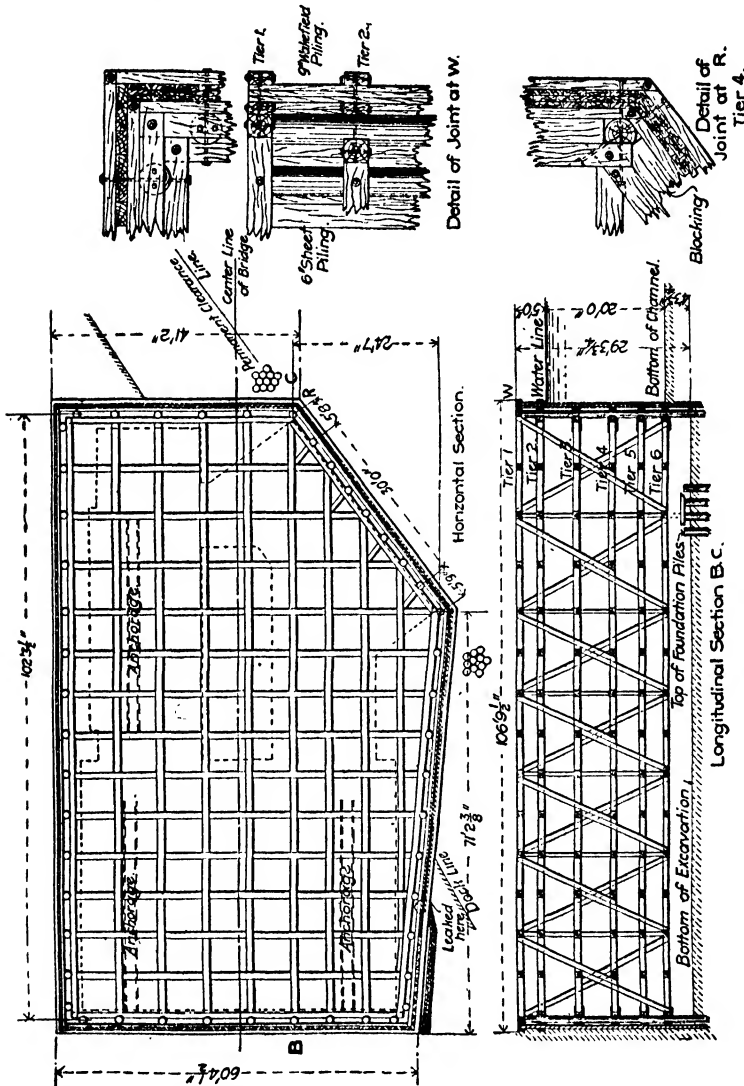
Cofferdam for Substructure of Rolling Lift Bridge at Taylor Street, Chicago.
